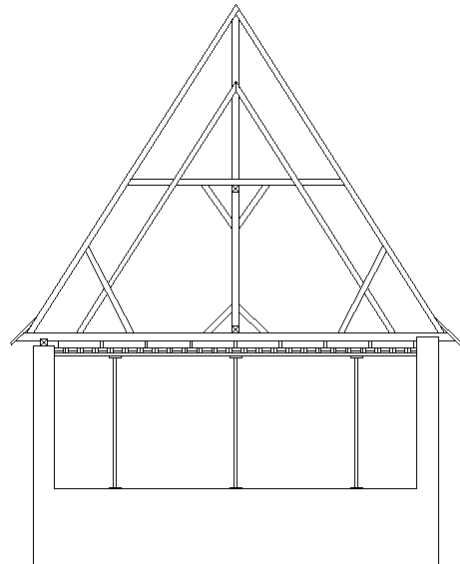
Removal of connecting nails between Tie-beam and the ceiling.
